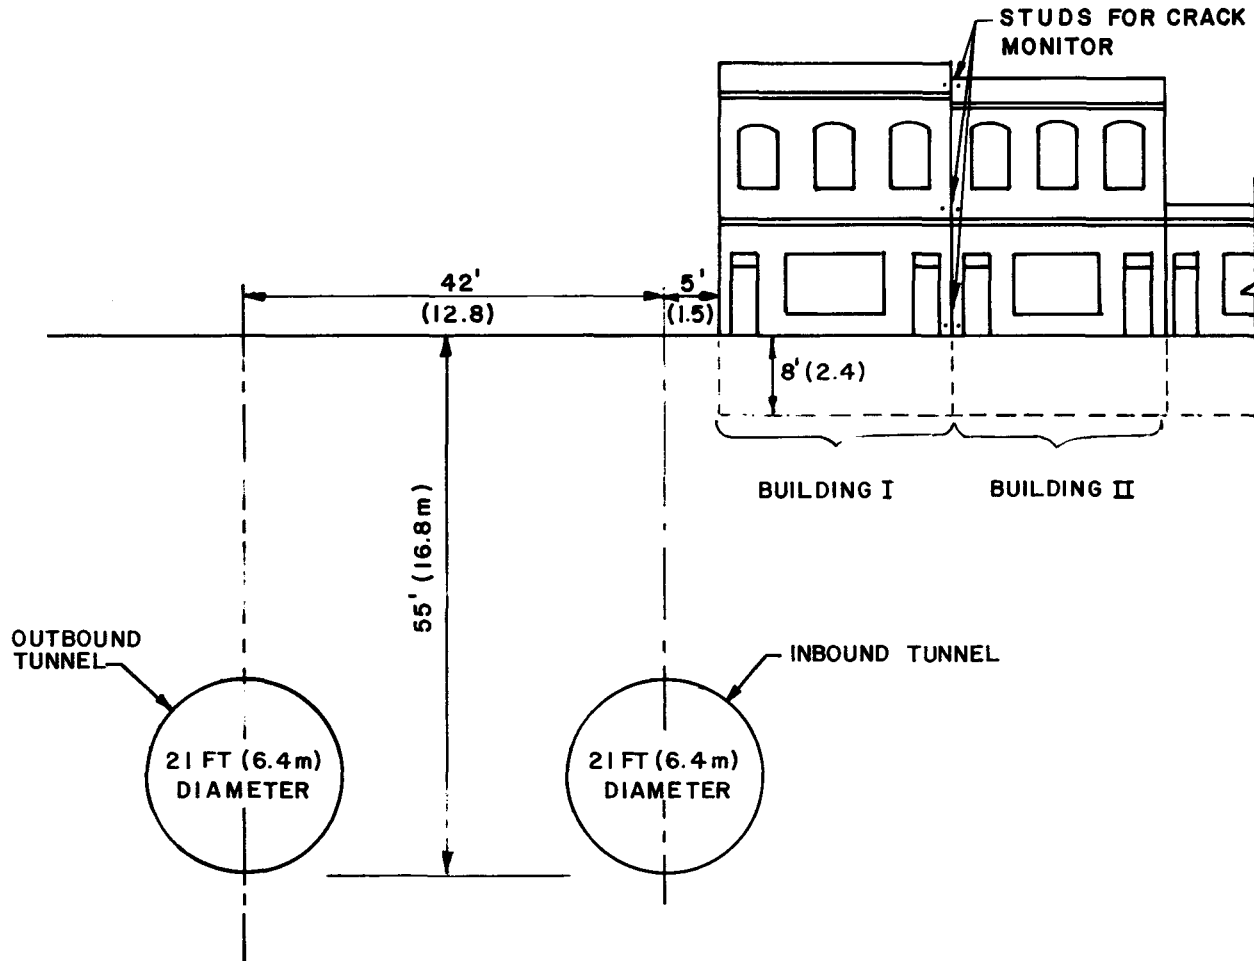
Profile Showing Relative Positions of Buildings and Tunnels
